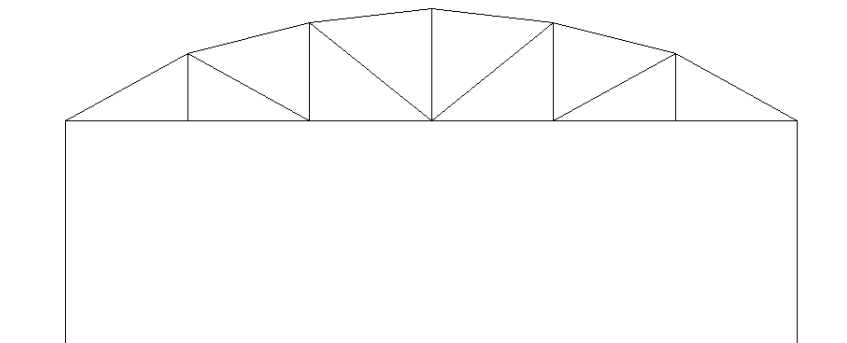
Modified Wood Truss Configuration with Top Chord Separated Into 6 Members
